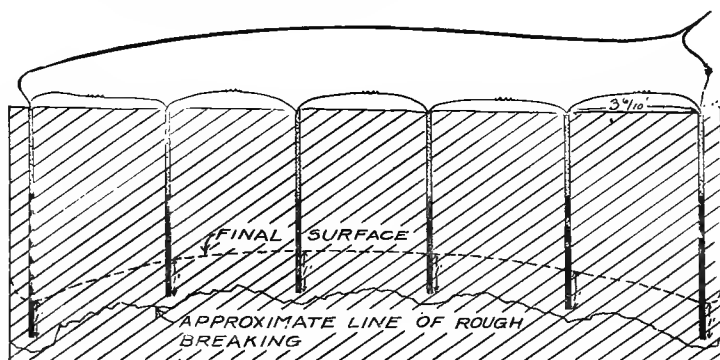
ELEVATION OF APPROXIMATE LOADING FOR CUT WORK
